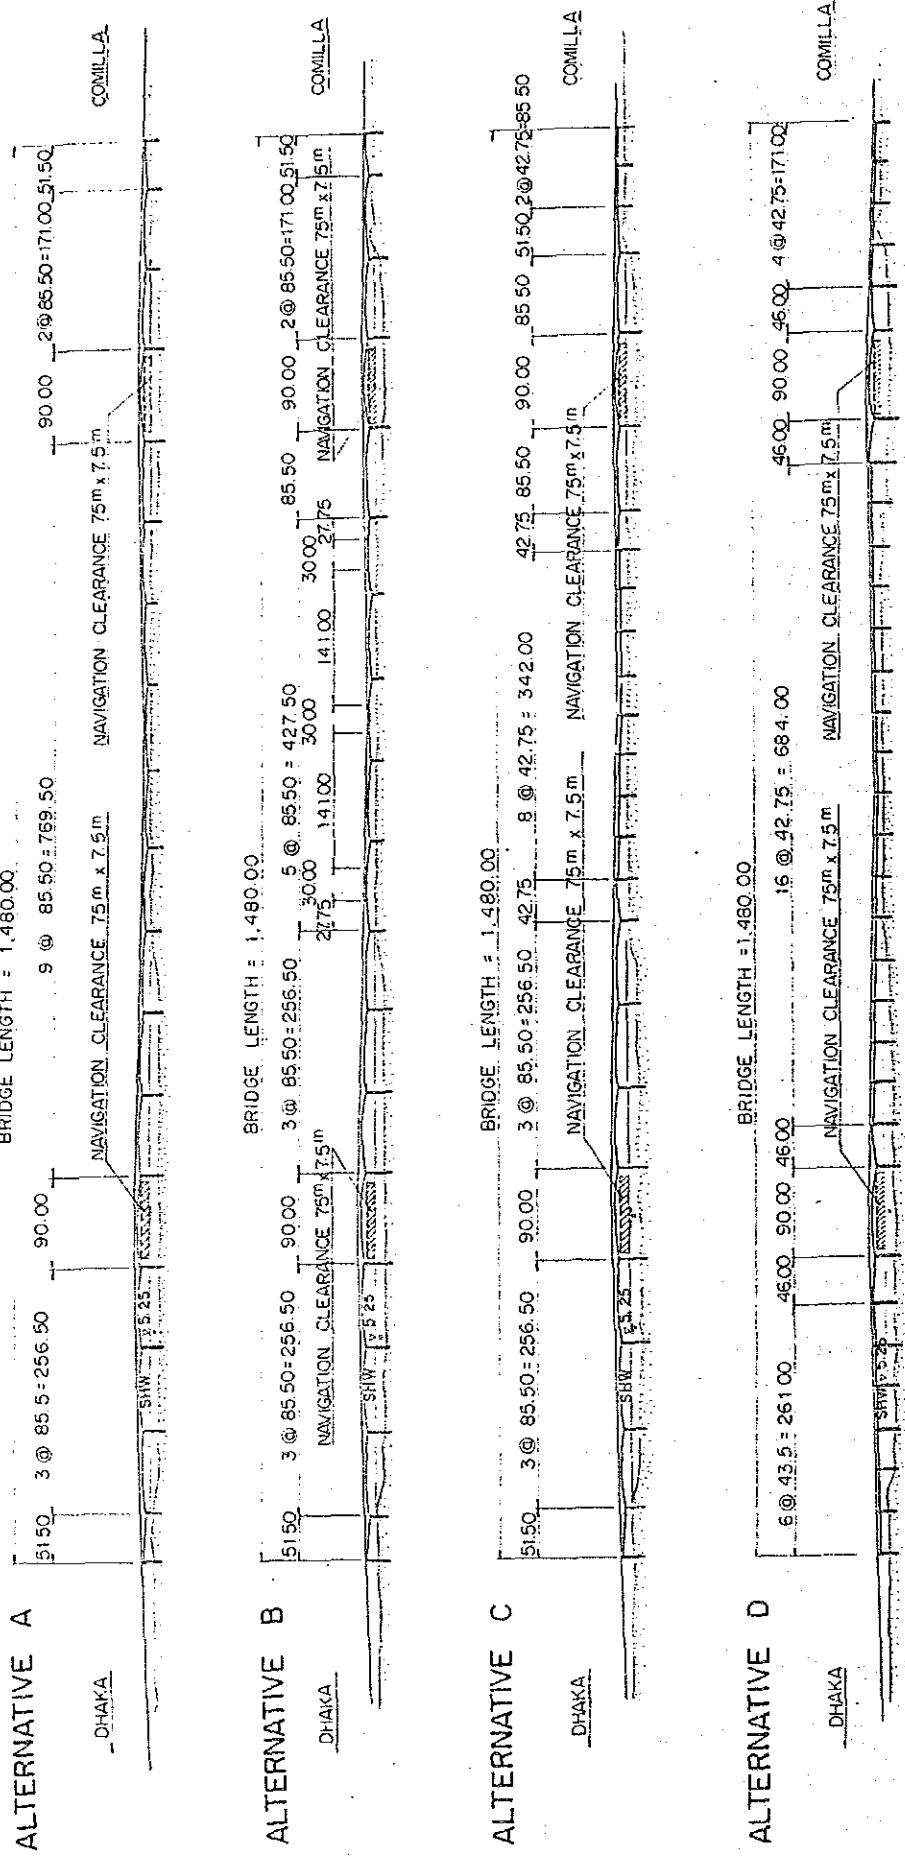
SPAN ARRANGEMENTS FOR MEGHNA-GUMTI BRIDGE
